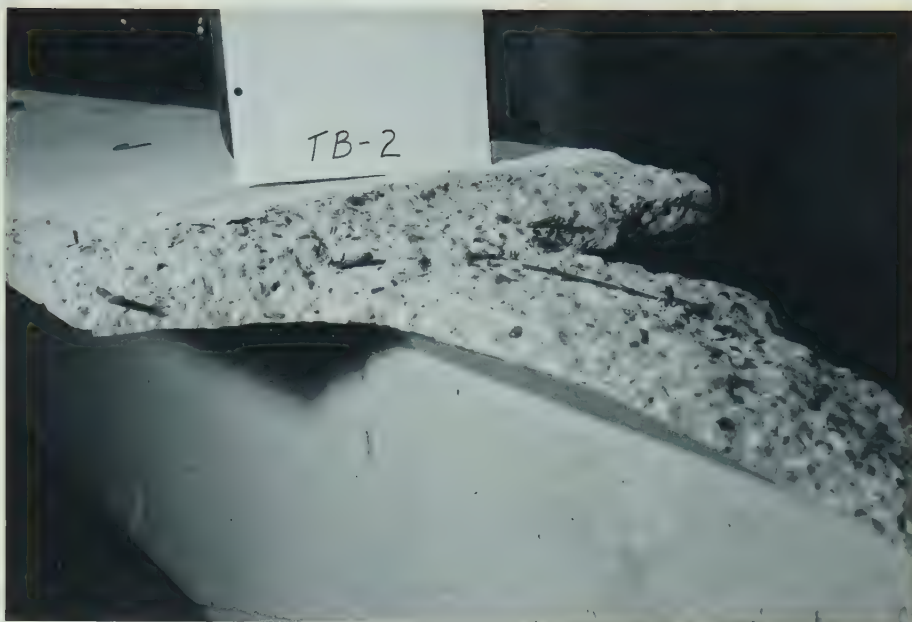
Failure crack above exterior anchorage wire at top of TB 2
